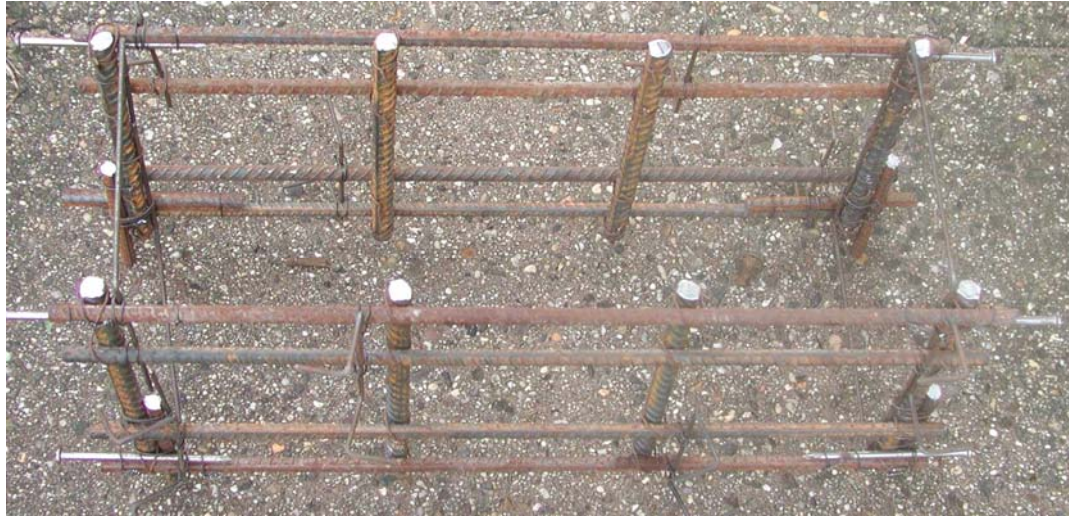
Finished Footing Reinforcement Cage for Large-Scale Model Columns.
